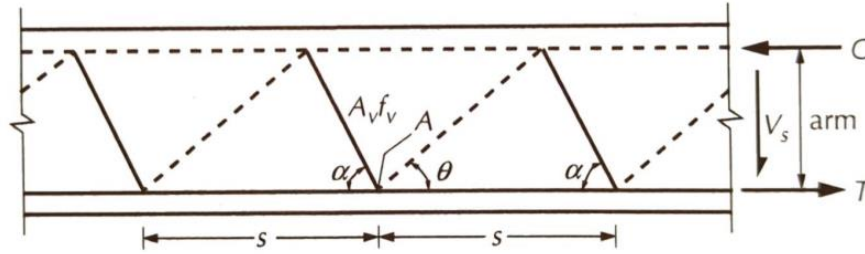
Truss Model for a Beam with Inclined Stirrups (from Pincheira et al. 2018).
